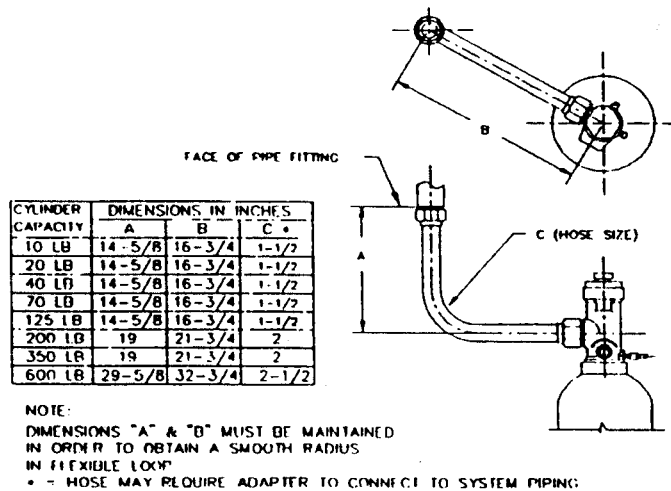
Installation of the Flexible Hose Directly into System Piping
